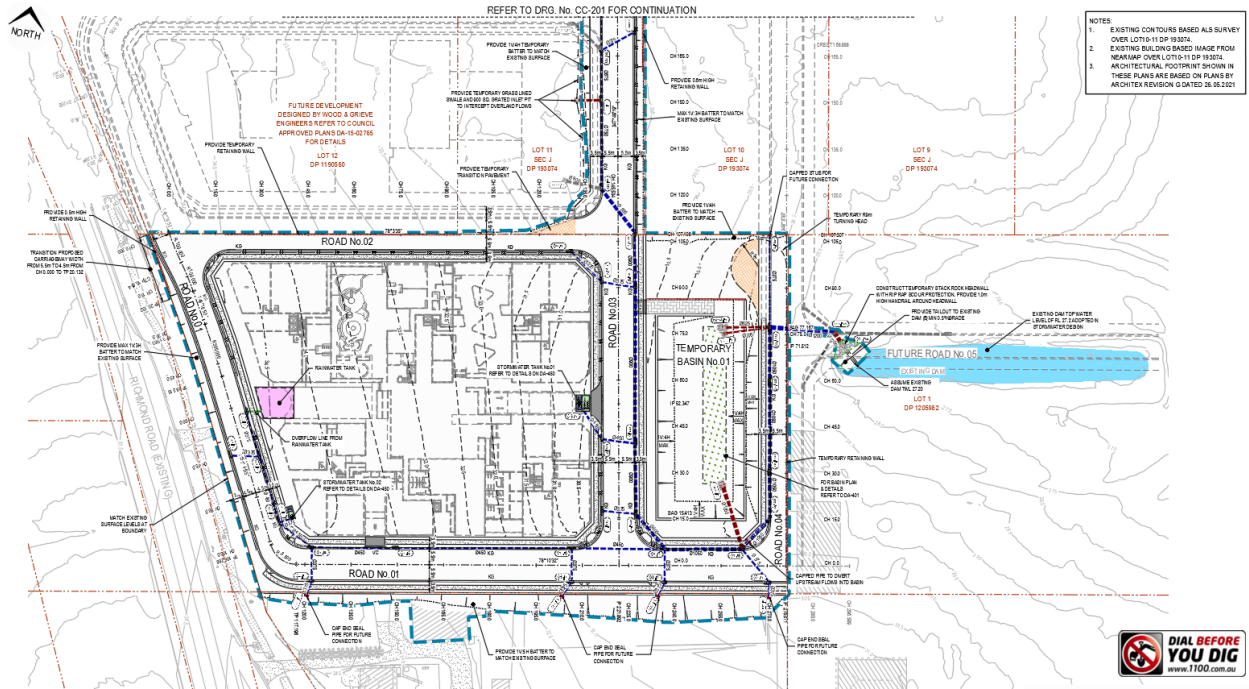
Engineering Plan by Orion (Refer Sheet 200 and 201 in Revision C plans)
